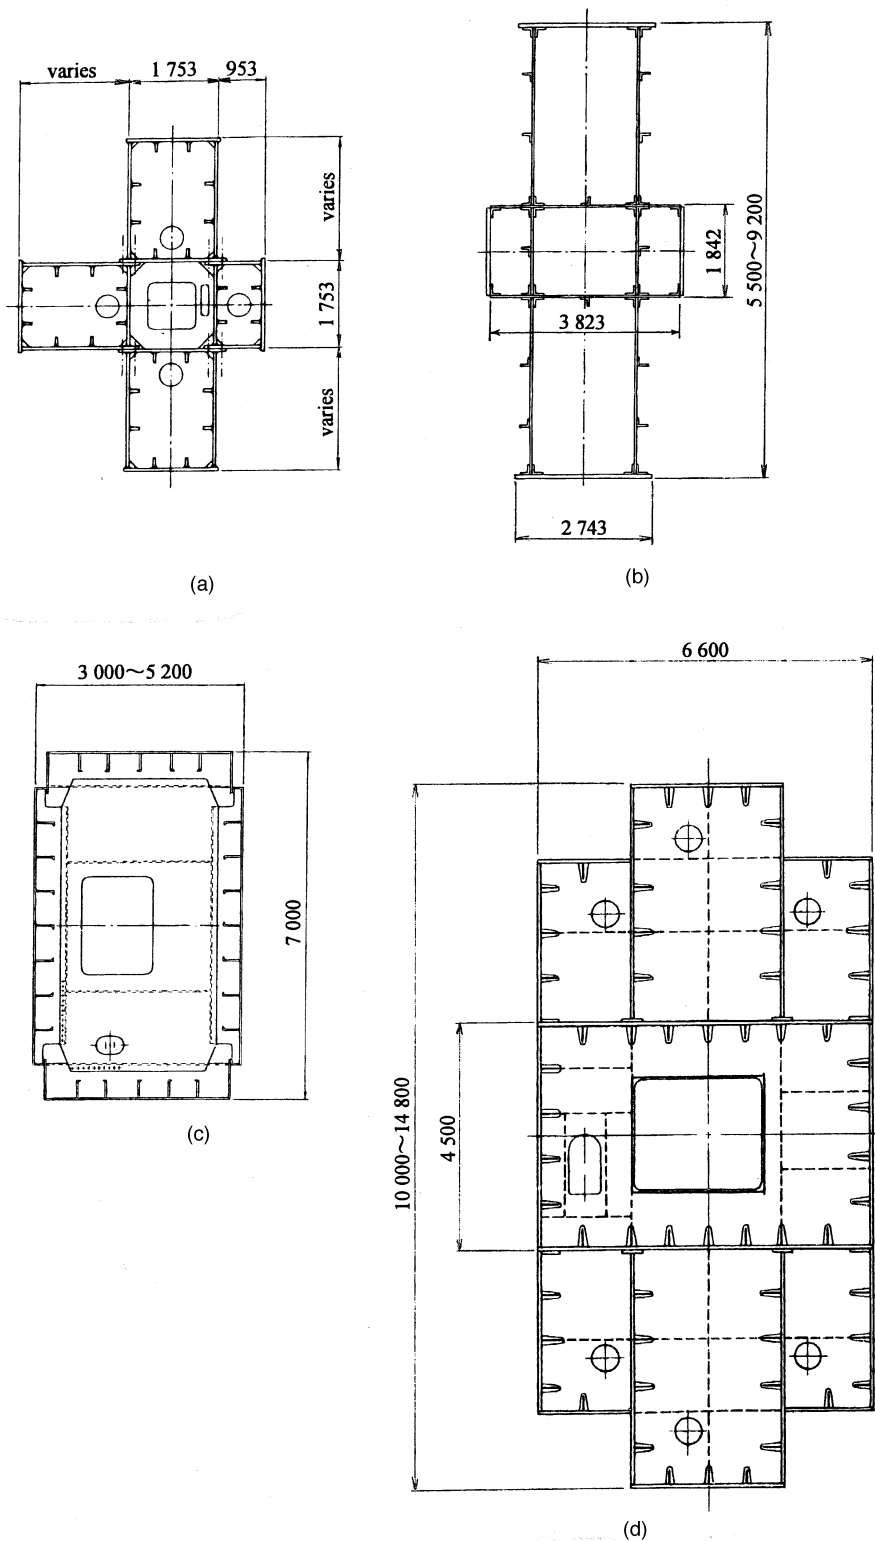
Tower shaft section. (a) New Port Bridge, (b) 25de Abril Bridge, (c) Bosphorus Bridge, (d) Akashi Kaikyo Bridge.
